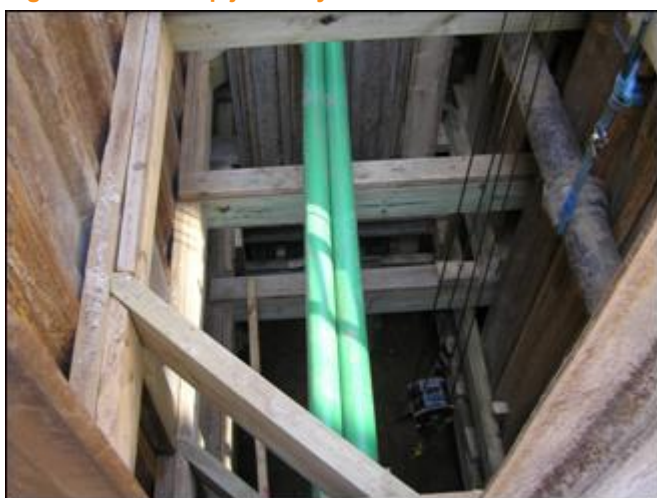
7m deep Shaft to access Backhill to Fisher St Oil filled cable
